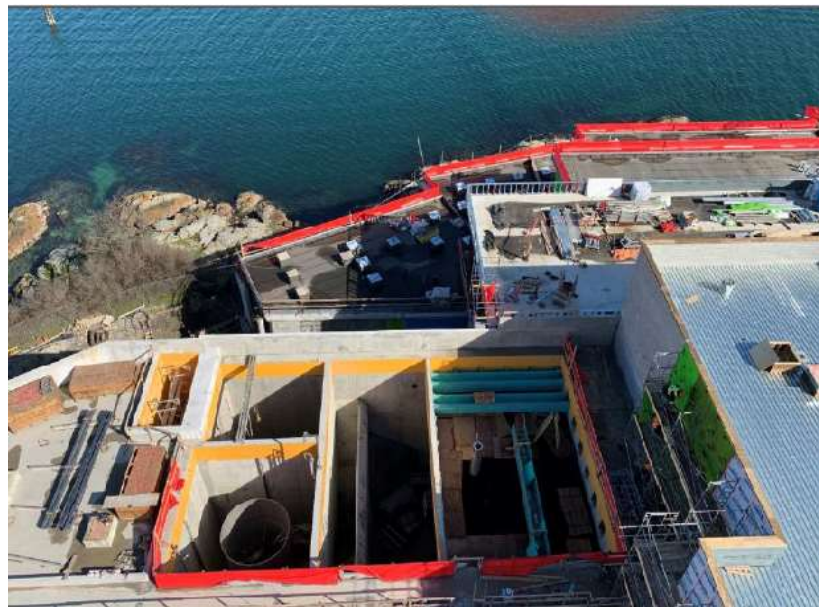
McLoughlin Point Wastewater Treatment Plant- View to the East from tower crane B.
